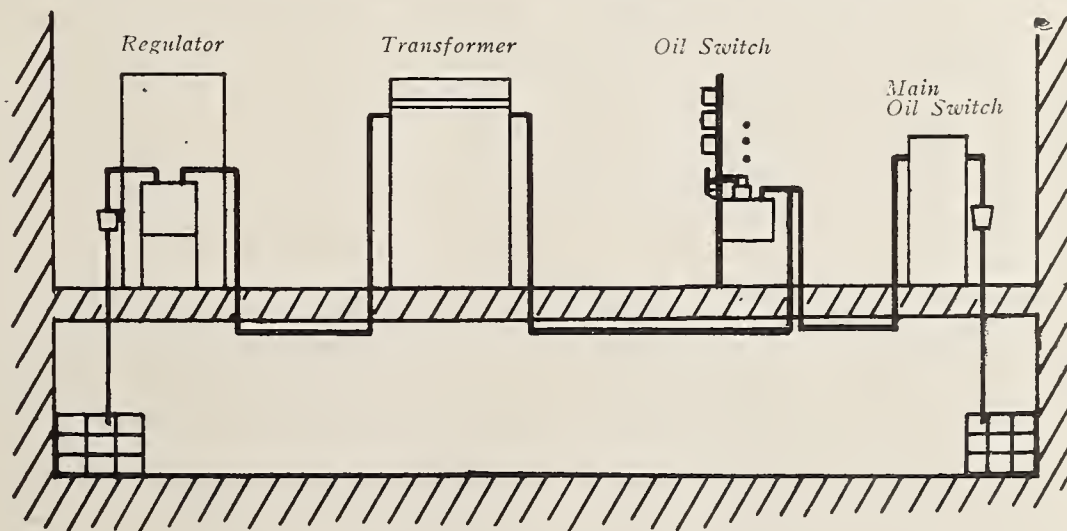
CROSS-SECTIONAL ELEVATION OF SUBSTATION
